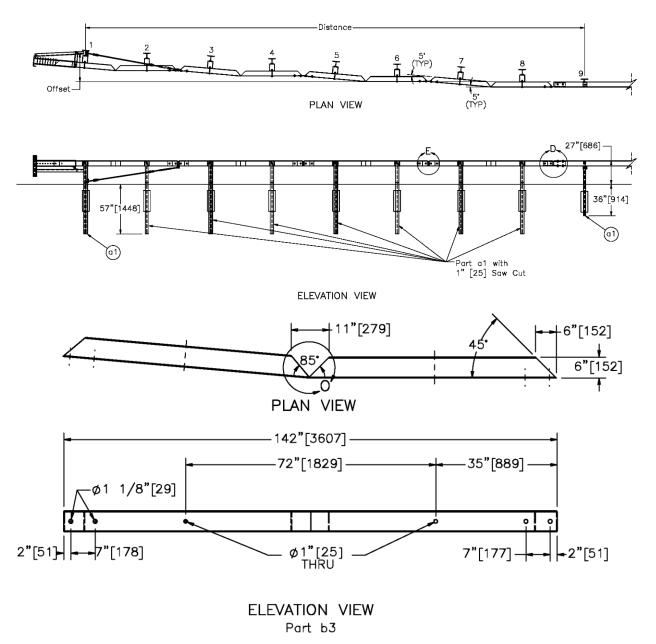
Plan and Elevation Views of Box Beam, Test No. NYT-1
